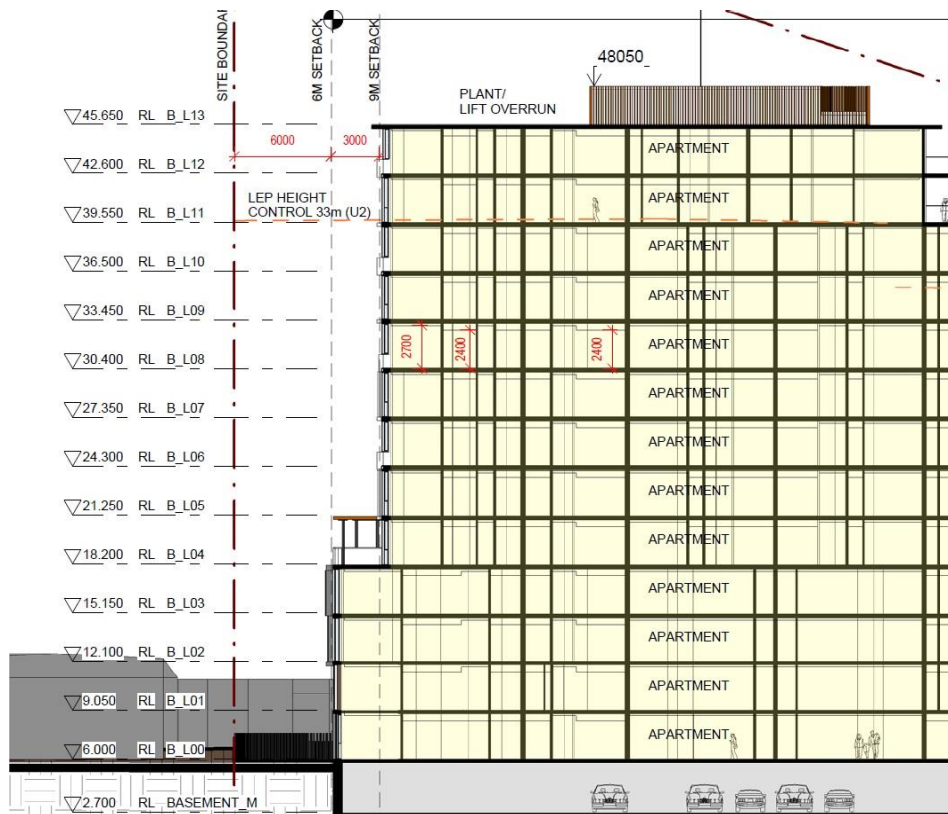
Extract from Building B Section demonstrating proposed separation distance to the north on upper levels
